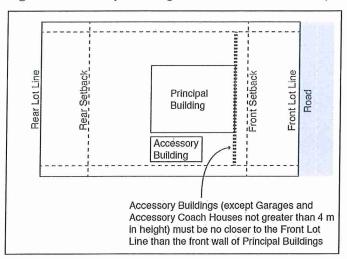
Accessory Building Front Setback Illustration (RS-1)
